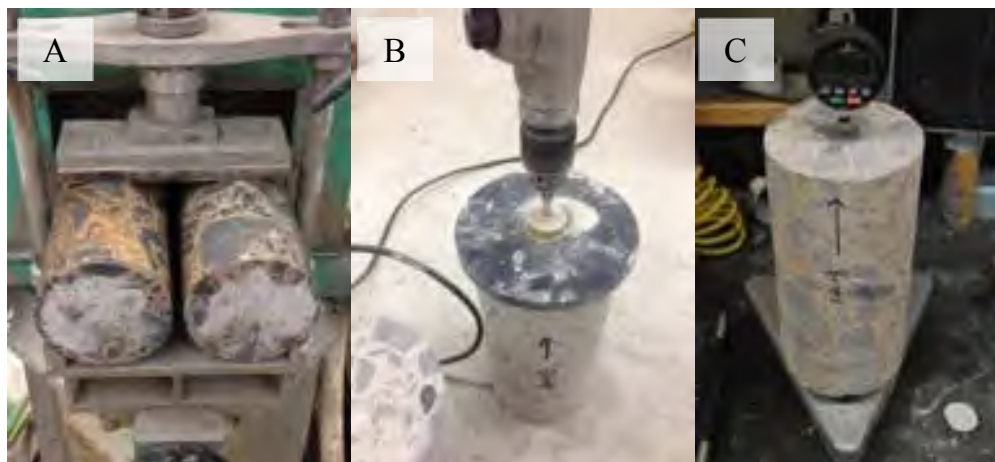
A) end-grinding cores, (B) drilling a quarter inch hole in each end using a template to ensure holes are drilled in the center of each end, (C) length measurement
